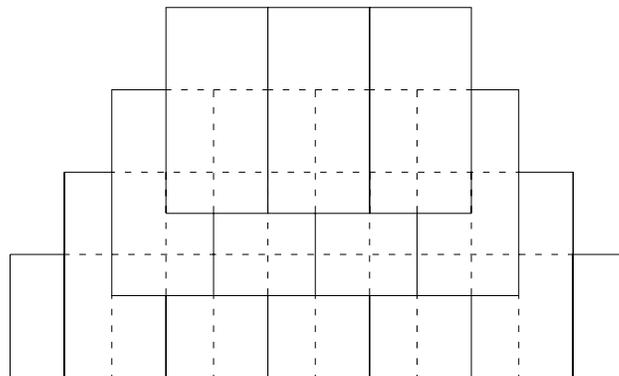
LAYOUT OF ENGLISH SHINGLES – TOP VIEW
